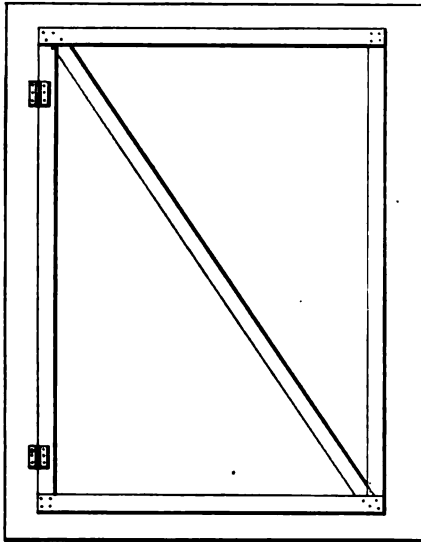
Big door of the little garage. presenting the plan of the framing, showing the diagonal bracing to prevent the door from sagging
